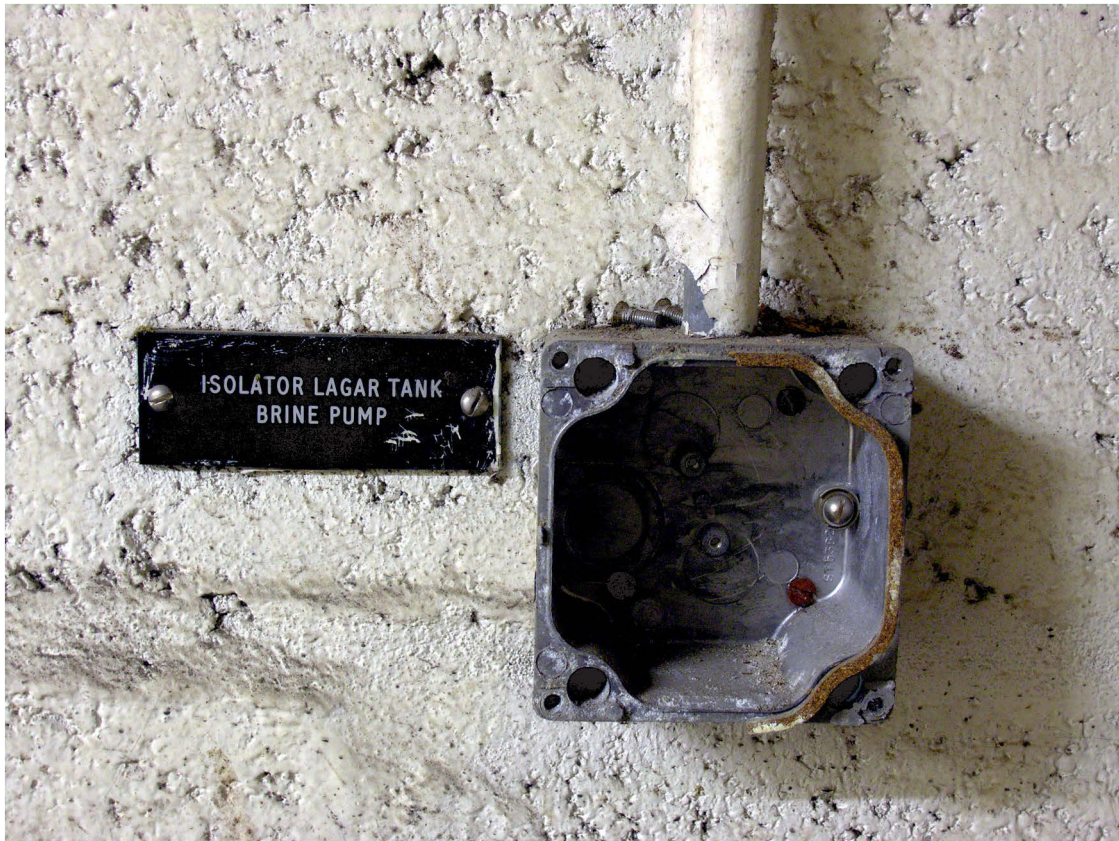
A label for a former pump switch, north wall, of the 5th floor, Area 3
